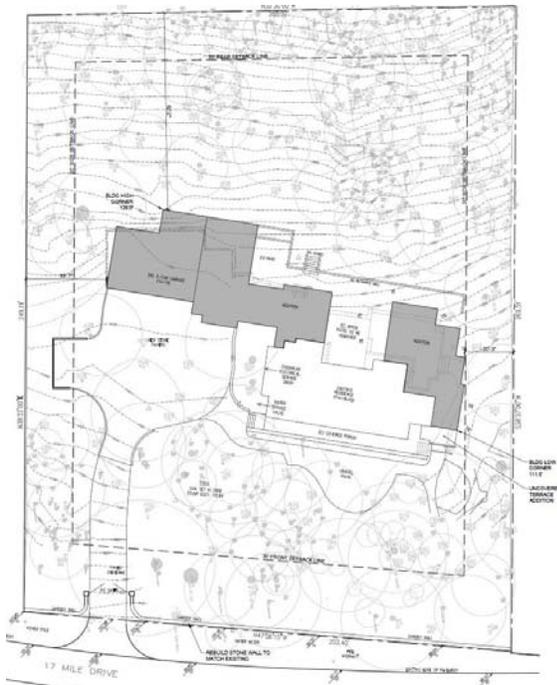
Site Plan showing new areas of disturbance (see shaded area)
